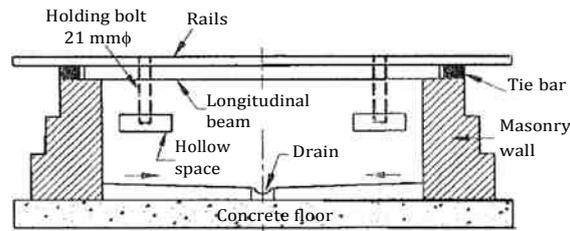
Sectional elevation of ash-pit or Examination-pit
